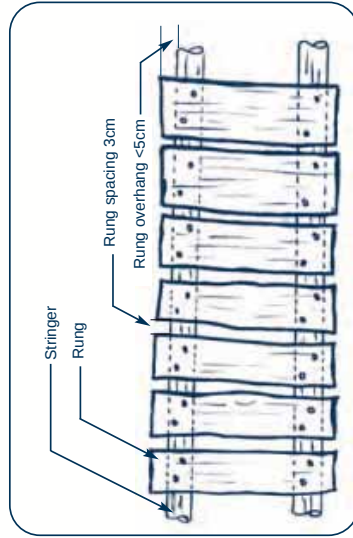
BRIDGE RUNG SPACING, RUNG OVERHANG
